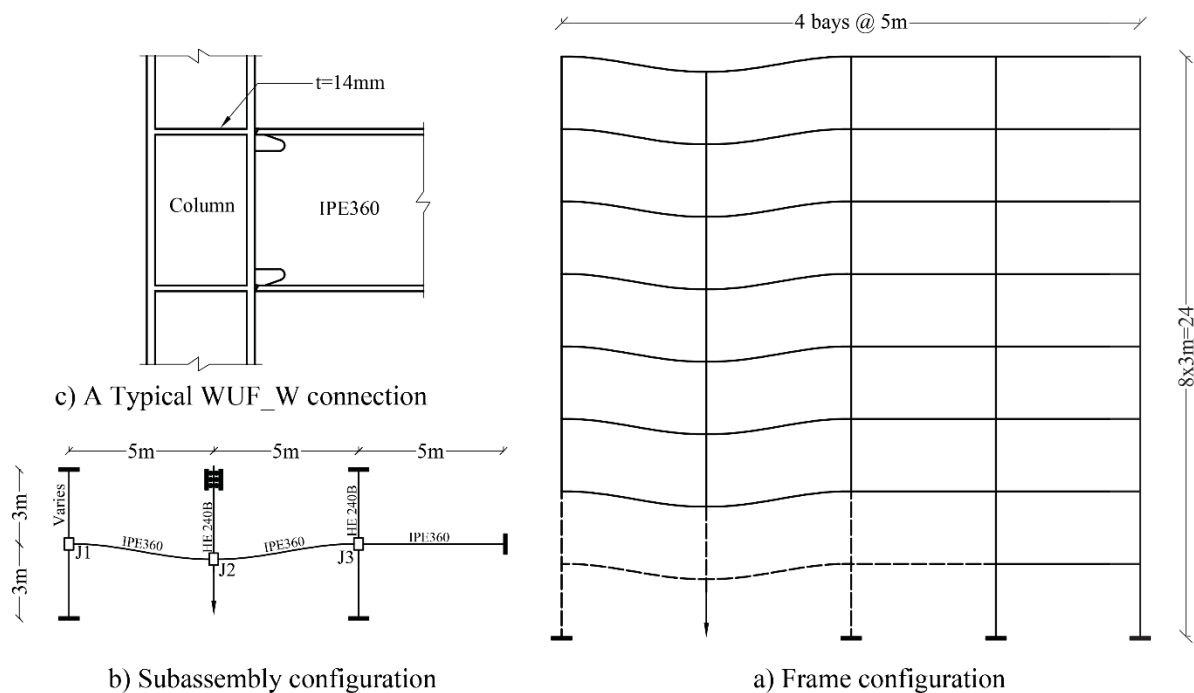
Configuration of a) the studied 8-story moment-resisting frame b) the subassembly c) Welded Unreinforced Flange-Welded web (WUF-W) connections.
